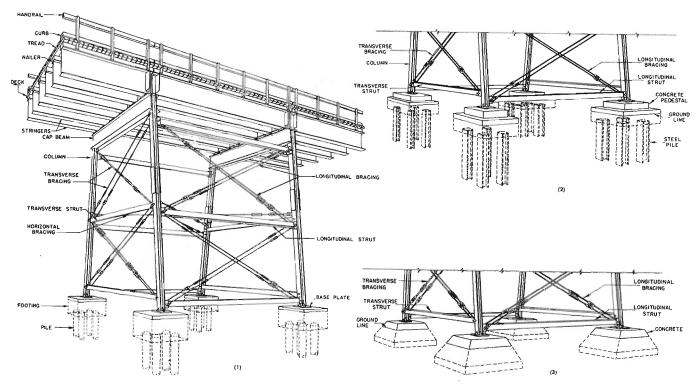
Highway bridge, class 25 or class 50, double-lane, steel stringer spans, steel tower:
